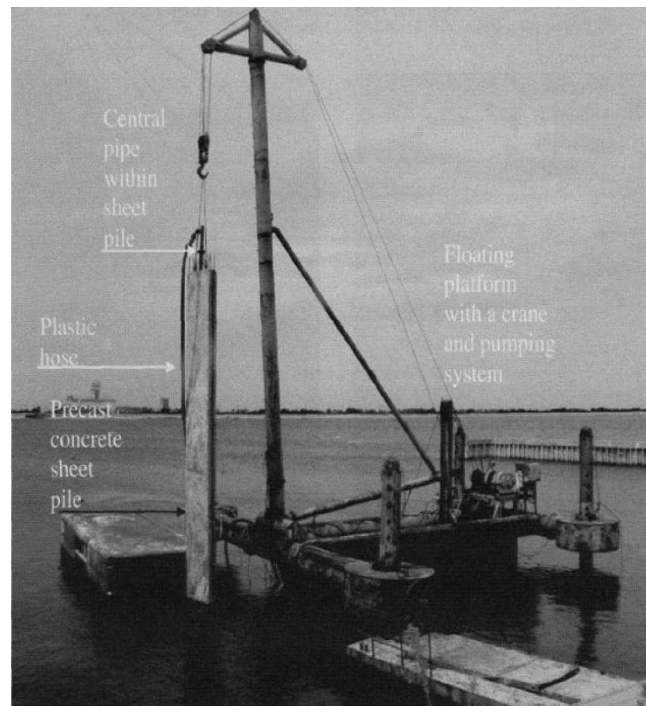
General view of the grouted jetted precast concrete sheet piling method
